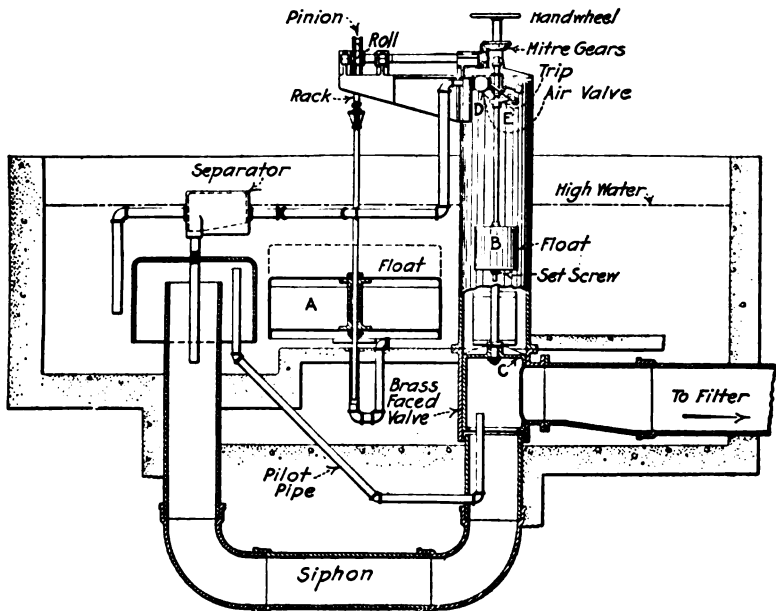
Sectional elevation of Barbour dosing apparatus at North Attleboro, Mass.
